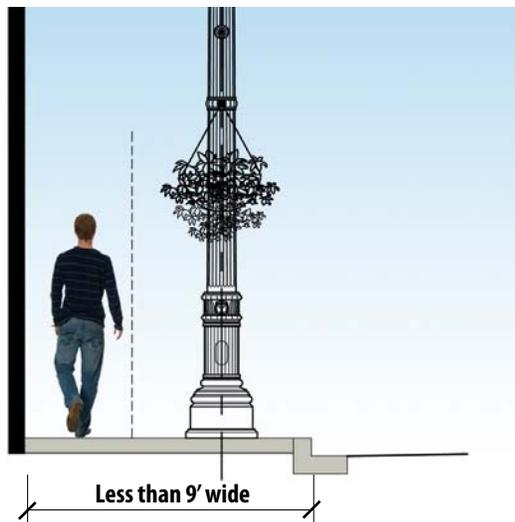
Shy Zones in sidewalks less than 9 feet wide
